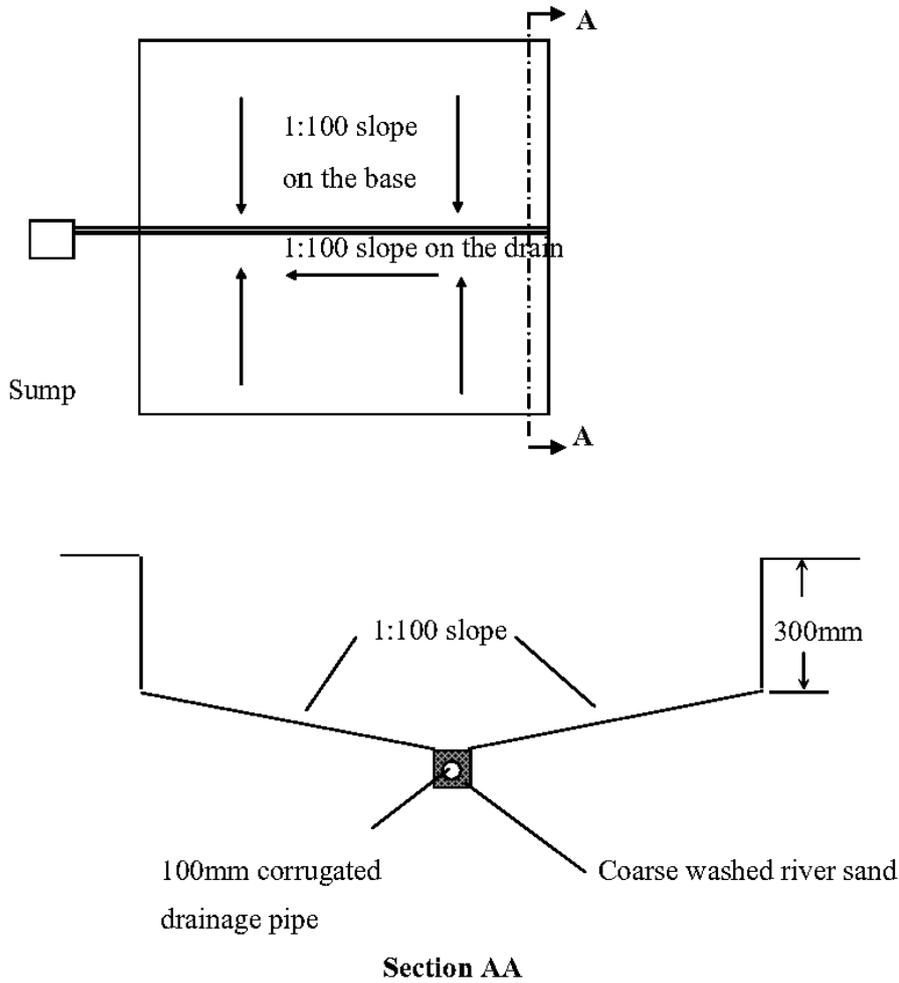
Shows the location of the central drain, and the slope on the base of 1:100 to the centre. Section AA shows the depth of the excavation and the base.
